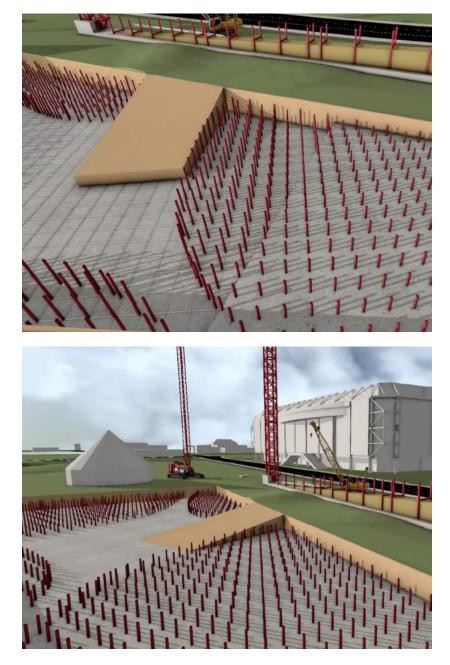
Mat foundation of approximately 4' thickness is then poured, anchoring the stanchions in place. MEP infrastructure is routed above this slab in a gravel layer and topping slab installation.
